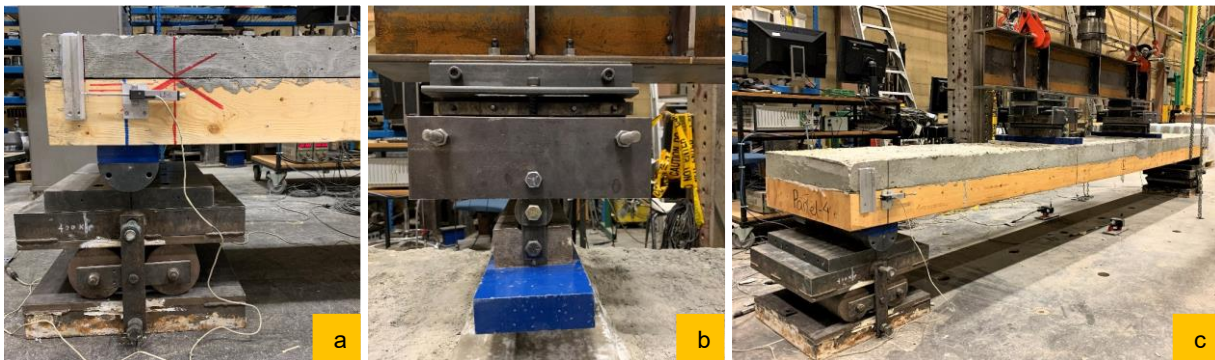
Bending test setup; a) roller support, b) distributed beam connected to needle roller bearing and, c) typical bending test setup of one specimen
